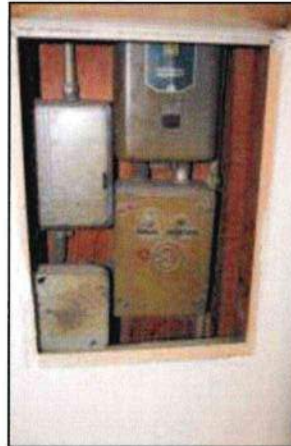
Fire Station #1 A view of an electrical box within a wall.
